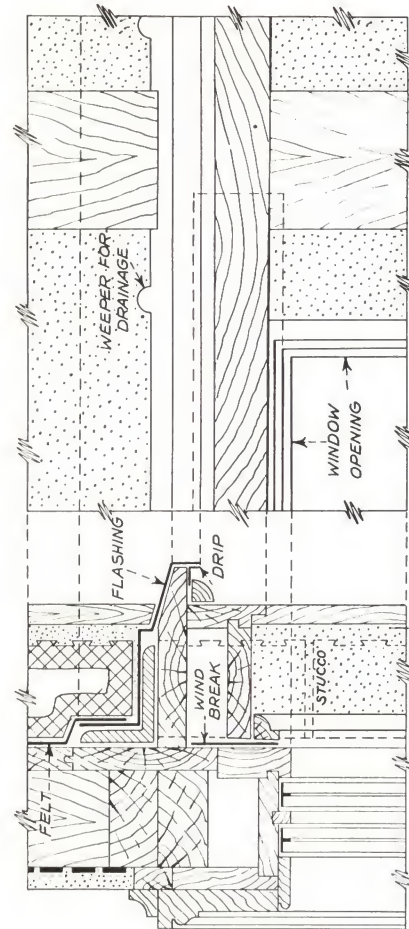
FLASHING WINDOW HEAD ON HOLLOW TILE AND STUCCO WALL - SCALE 1 1/2" = 1'-0"
